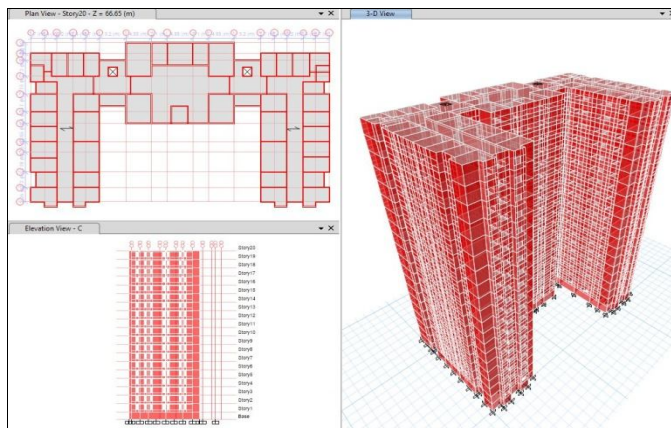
Plan, Elevation & 3D View of Mivan Construction
